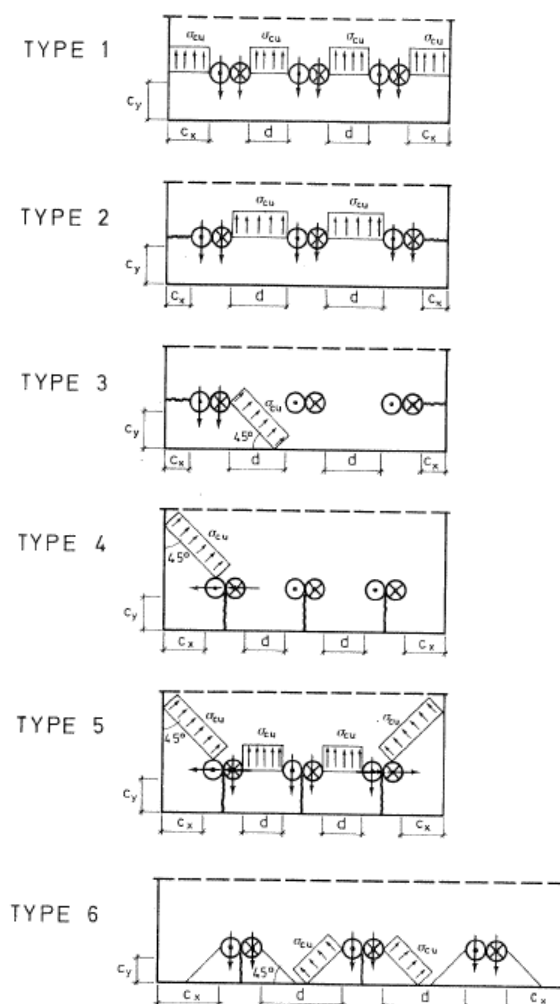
Possible ultimate splitting failure crack patterns for overlapped steel bars (Tepfers, 1973)
